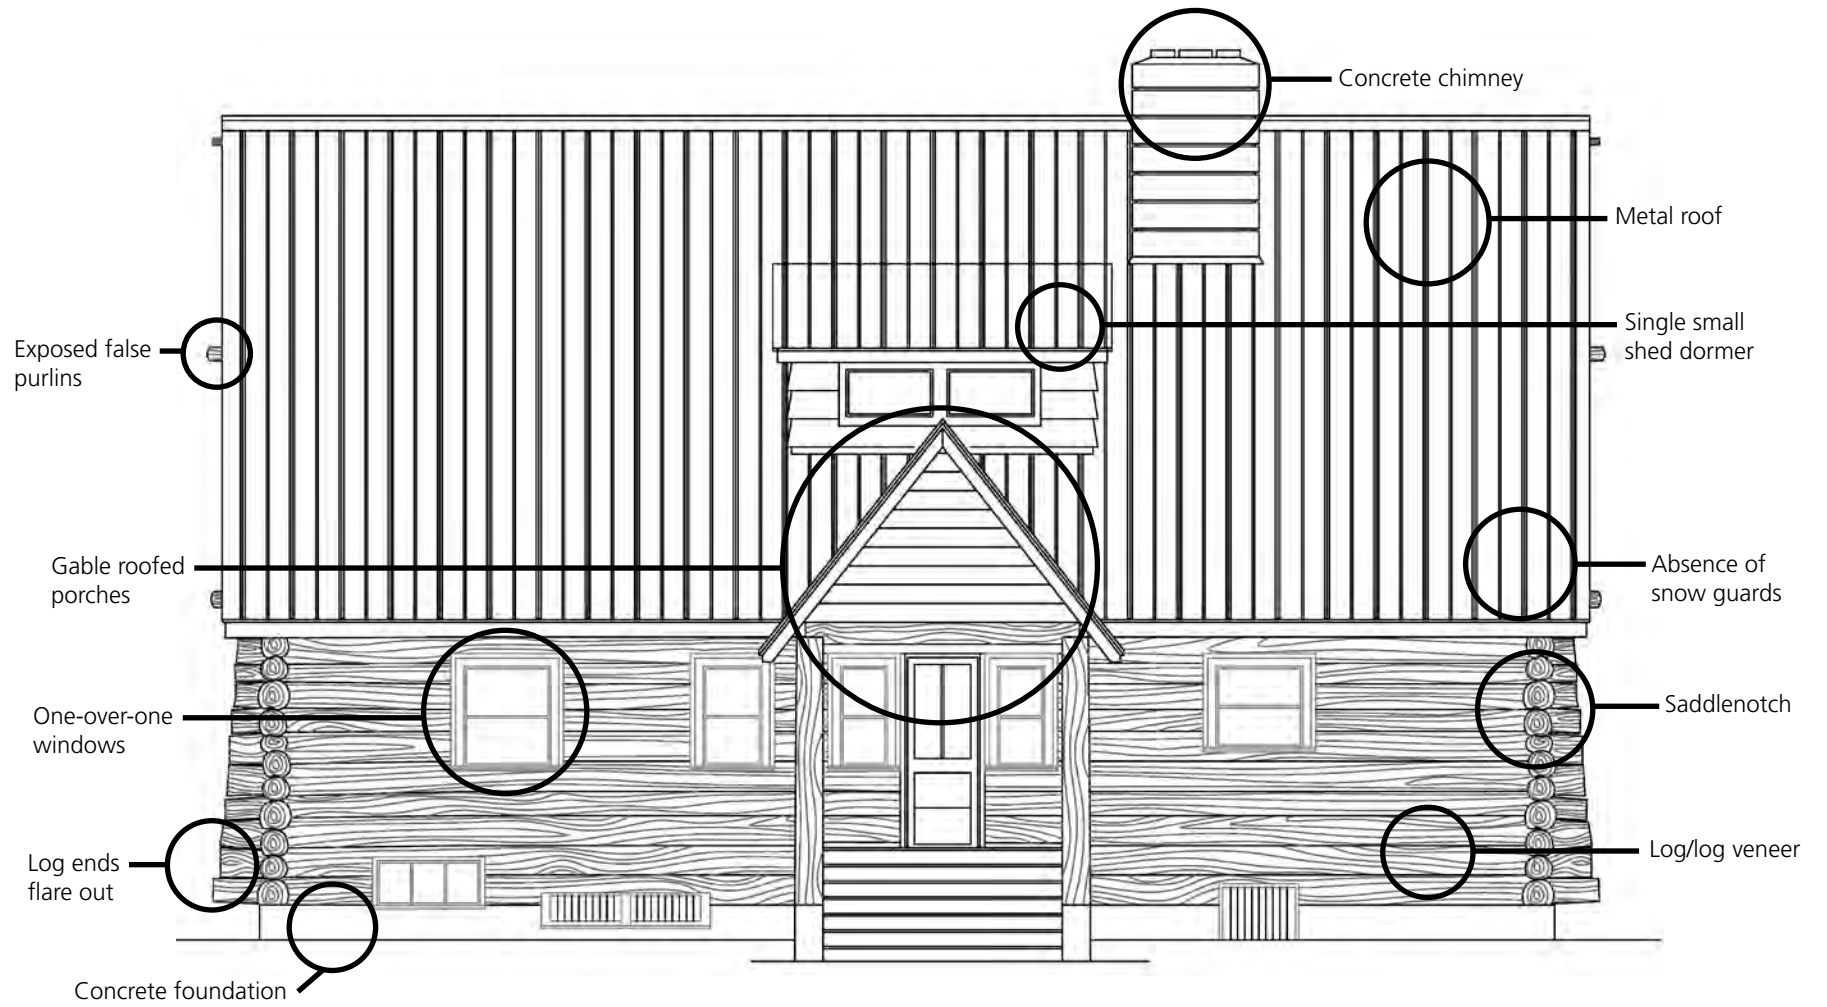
Building 23, South Elevation, 2012 (NPS Alaska Regional Office)
